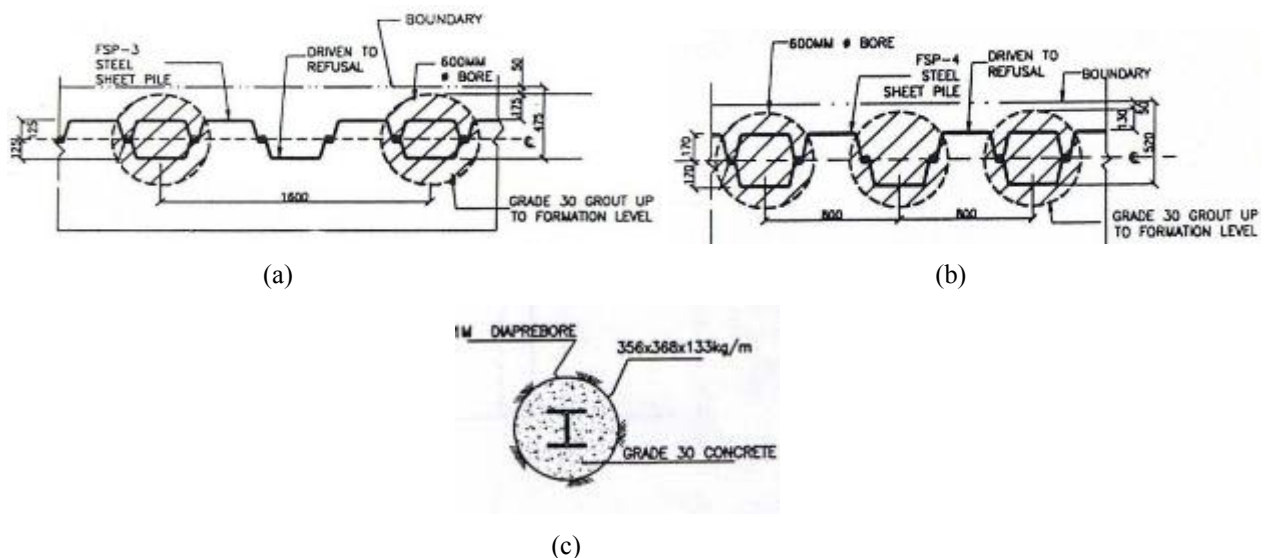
Partial boring solutions – (a) preboring only for 1 in 4 'box' sections, (b) preboring for both alternate piles and 1 in 4 'box' sections, (c) KP toe section.
